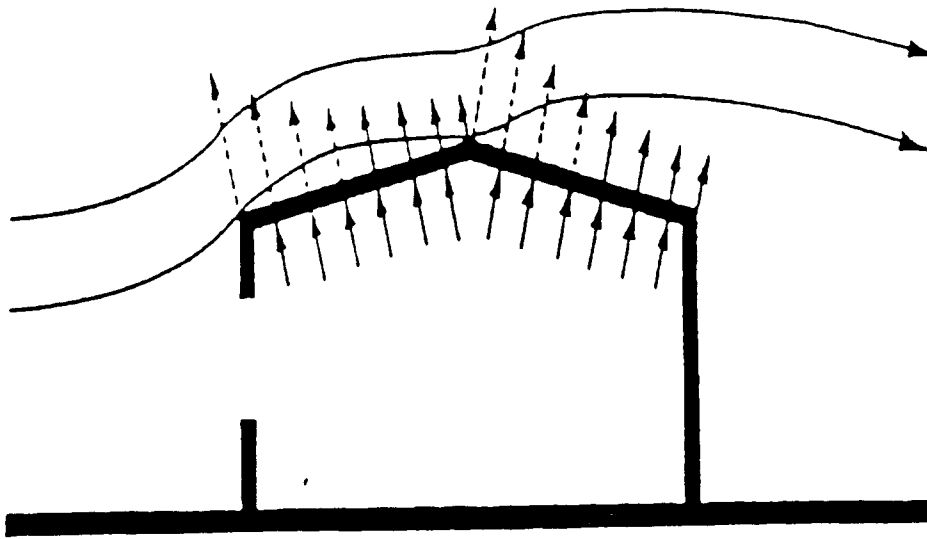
Internal Pressurization and Suction Due to Wall Openings
